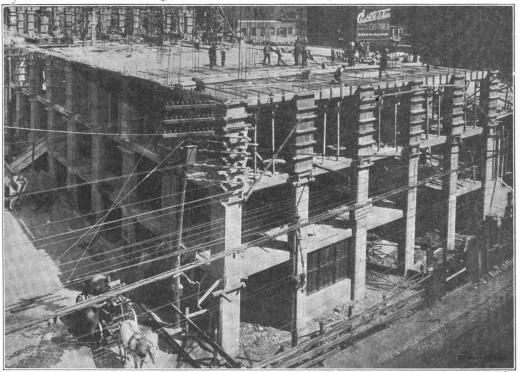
The Building Completed Up to the Fourth Floor and Forms Erected for the Fifth Floor Columns.
